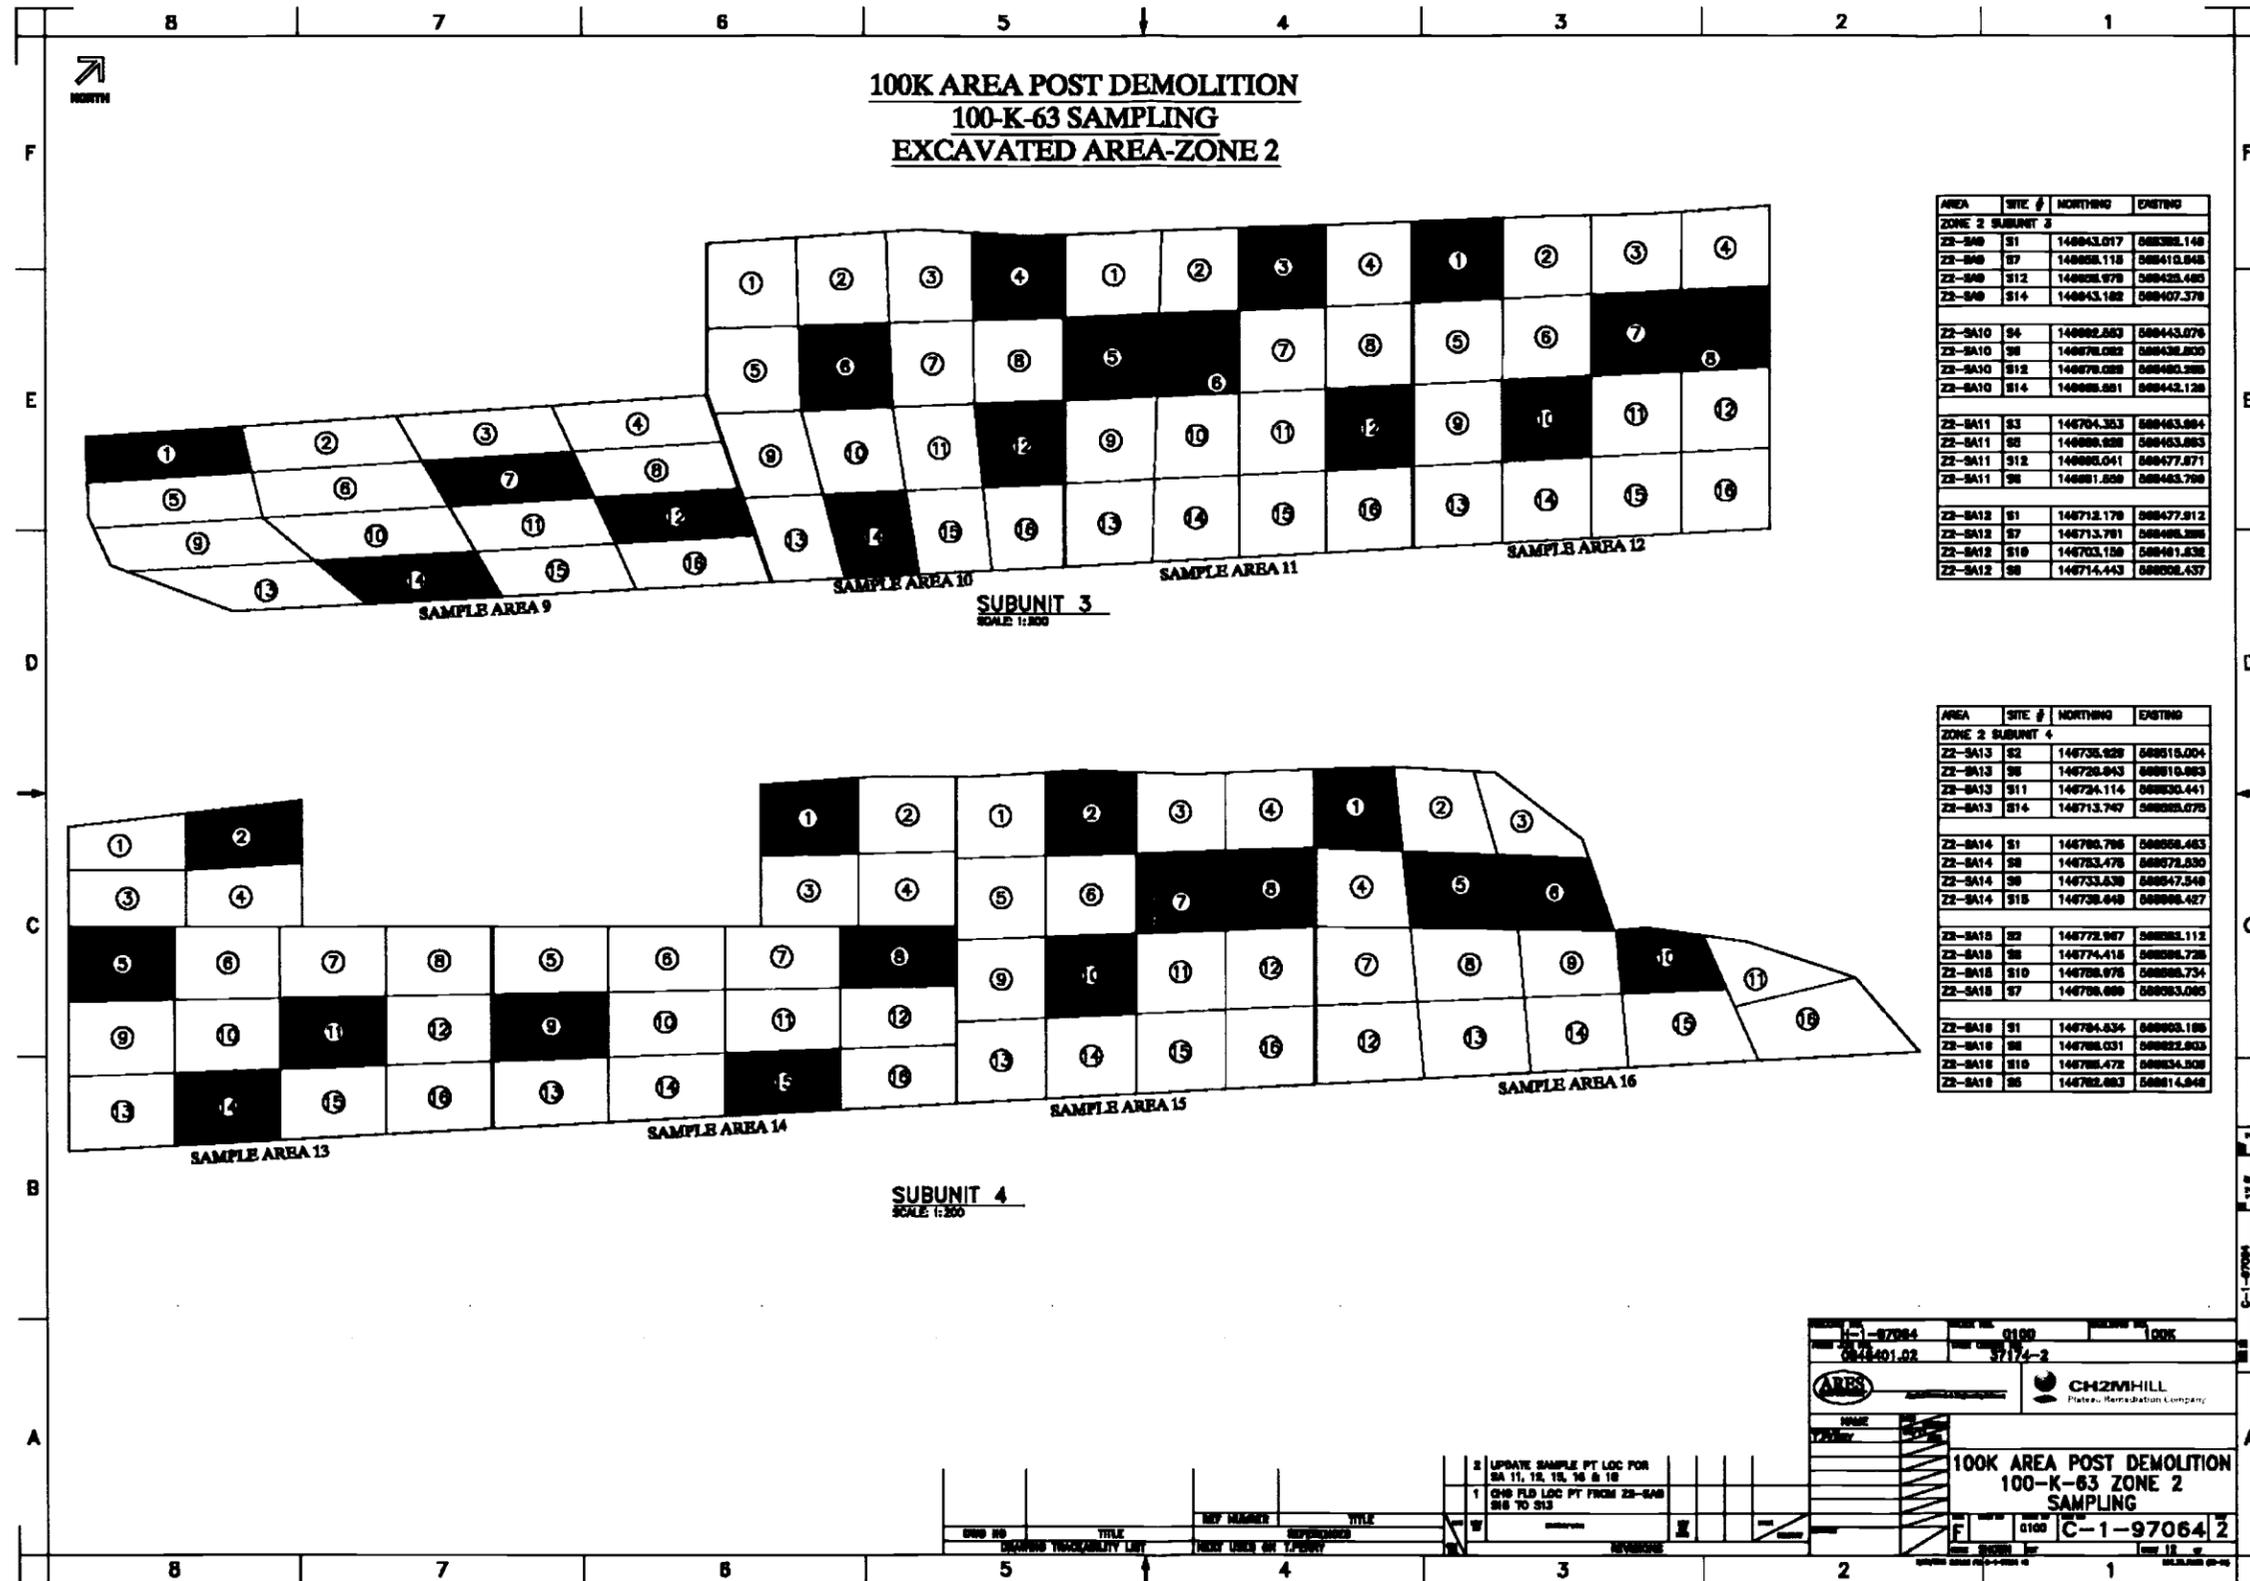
Zone 2 Subunits 3 and 4 Sample Design Layout
